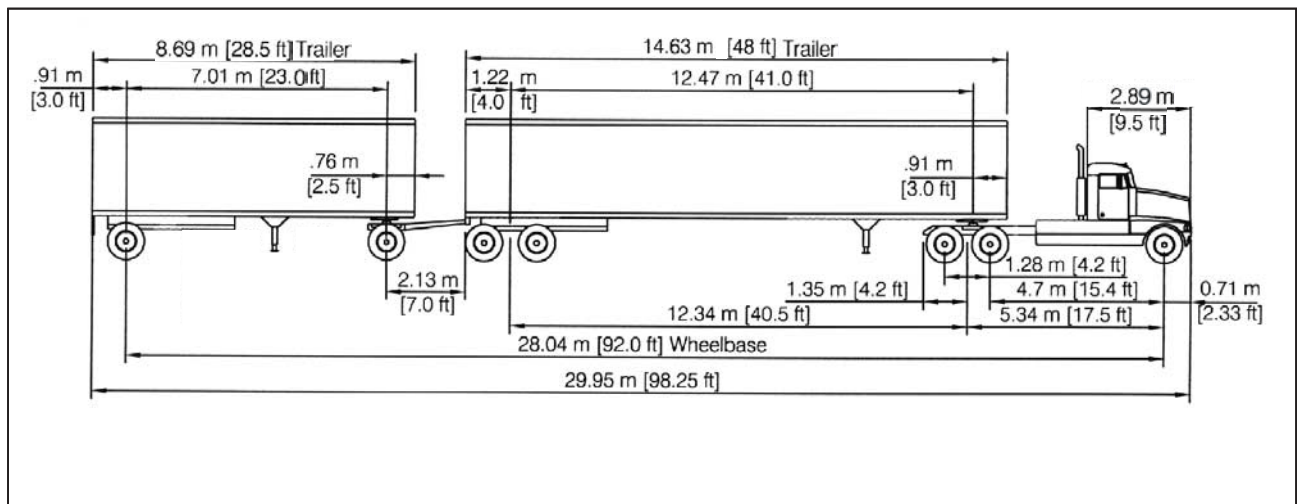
Recommended dimensions of Rocky Mountain Double combination (WB-28D [WB-92D]) design vehicle.
